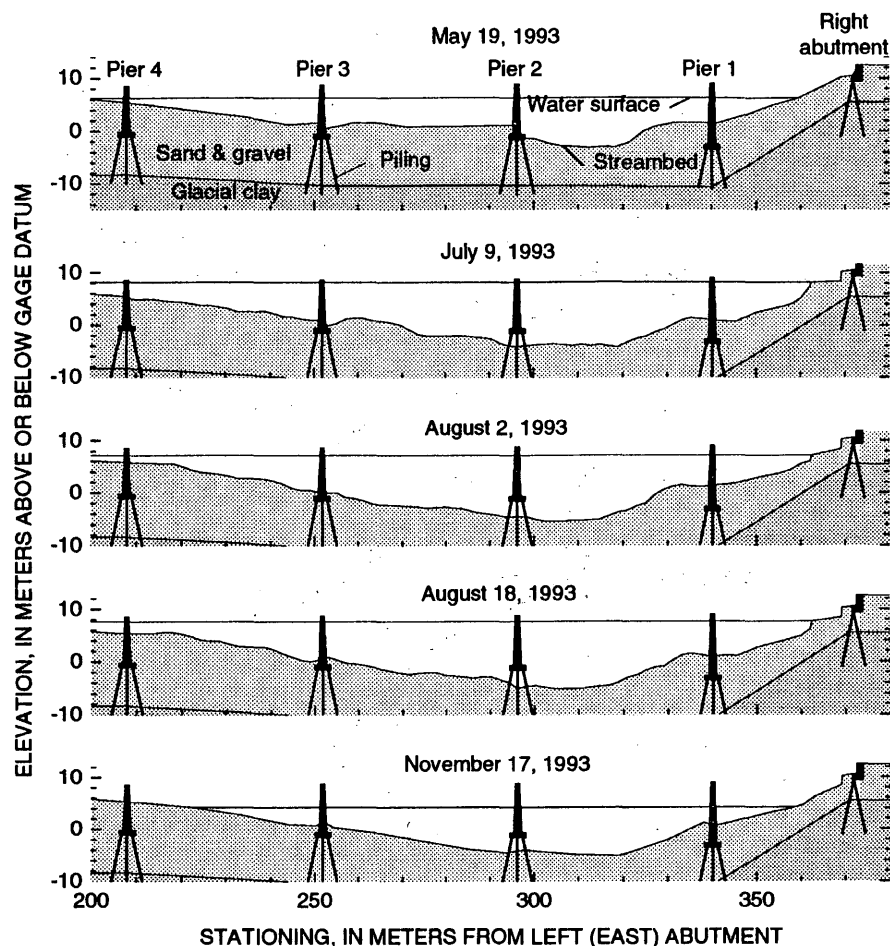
Streambed elevations at State Highway 99 over Iowa River at Wapello, Iowa (all cross sections shown were measured along upstream side of bridge except May 19, 1993, section, which was measured along downstream side of bridge; 1 m = 3.28 ft).
